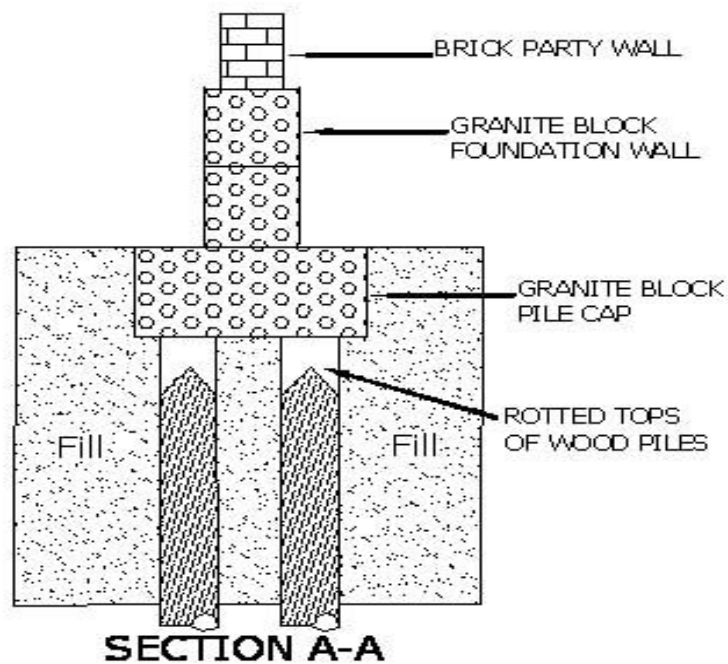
Cross Section of Granite Block Pile Cap Supported on Wood Pile and Foundation Walls Above
